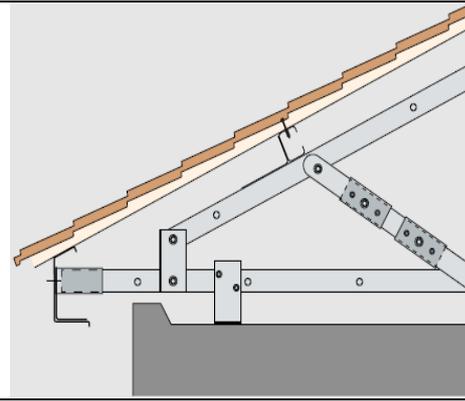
Flat to pitched truss system with composite steel tile panel (PUR/PIR)
